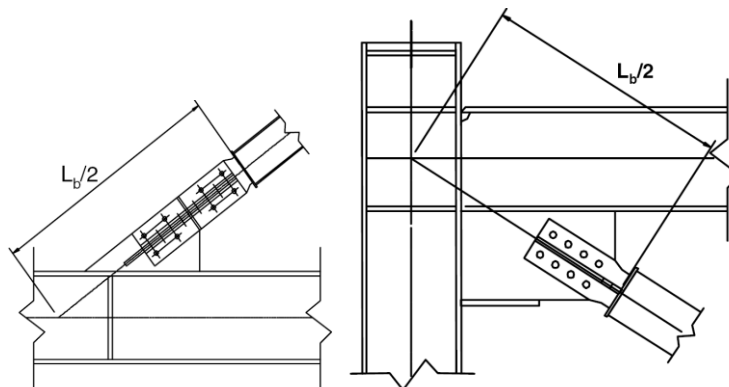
a) Splice plate details for single - cored BRB end connections; b) Double tee to gusset connection detail for double cored BRB end join [15]
